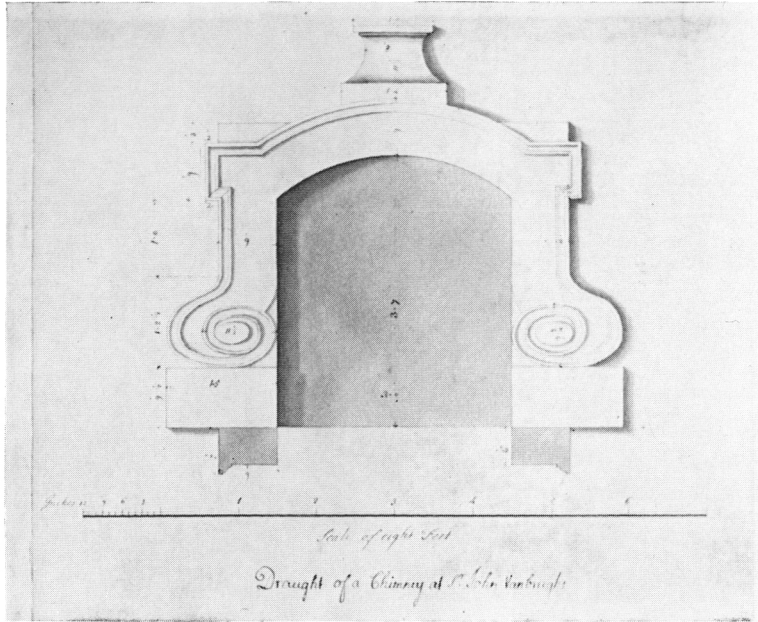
Plan and elevation of a chimney at Vanbrugh Castle, Blackheath [73]
